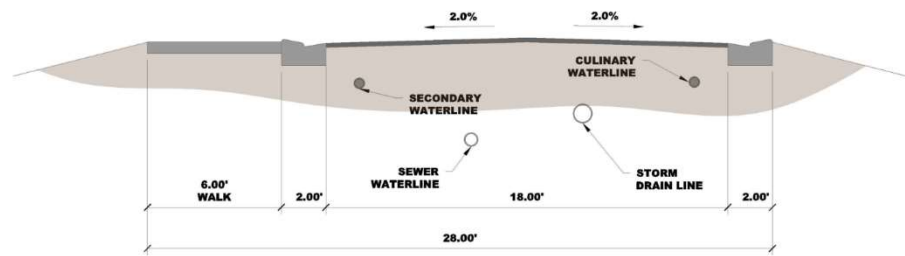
STREET CROSS SECTIONS MASTER PLAN
